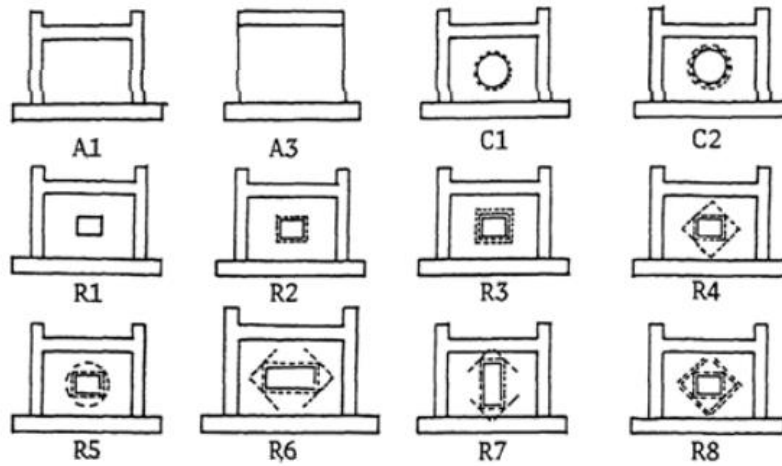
Wall Specimens with different types of Openings and Reinforcement [17]
